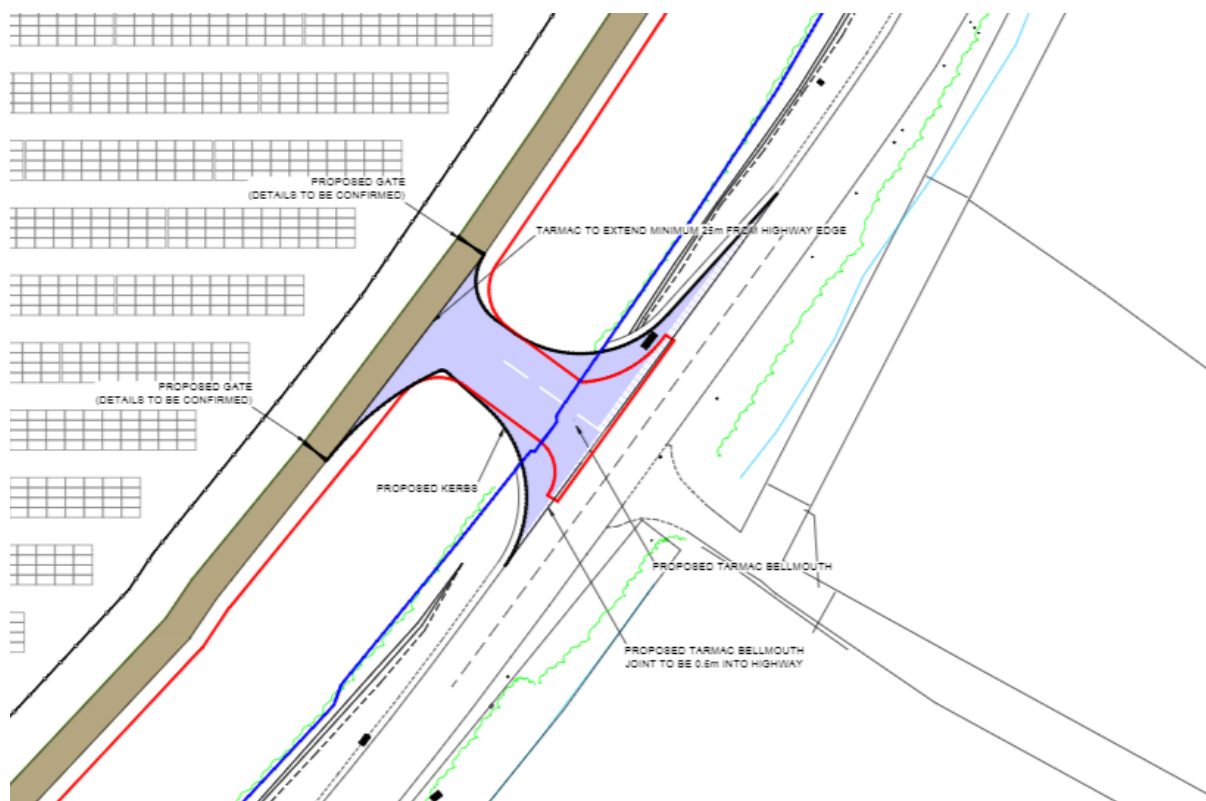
Extract from HC1002/05/23 r1 - Site Access Details
